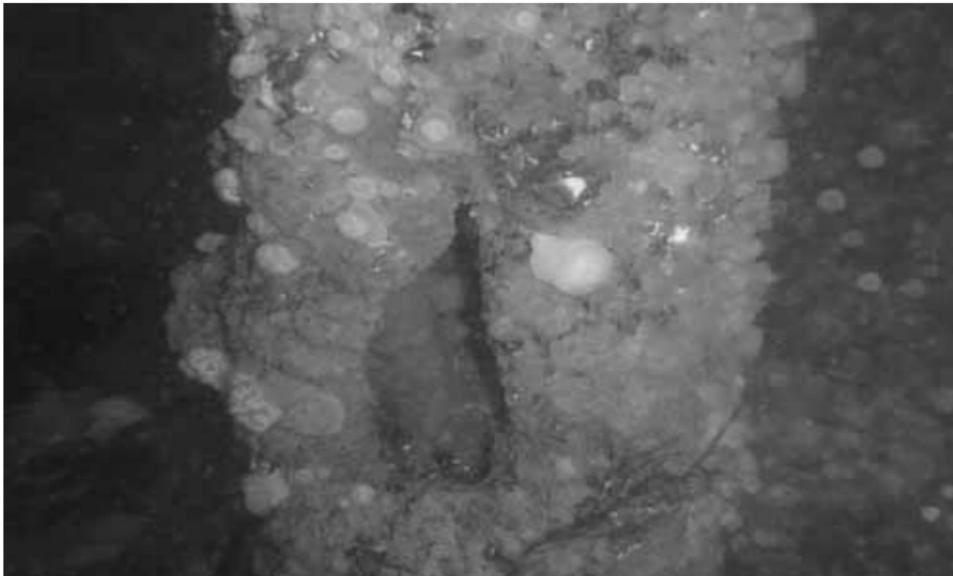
Canal Bridge No. 6880 - marine borer cavity on Pile No. 4 on Pier No. 6.
